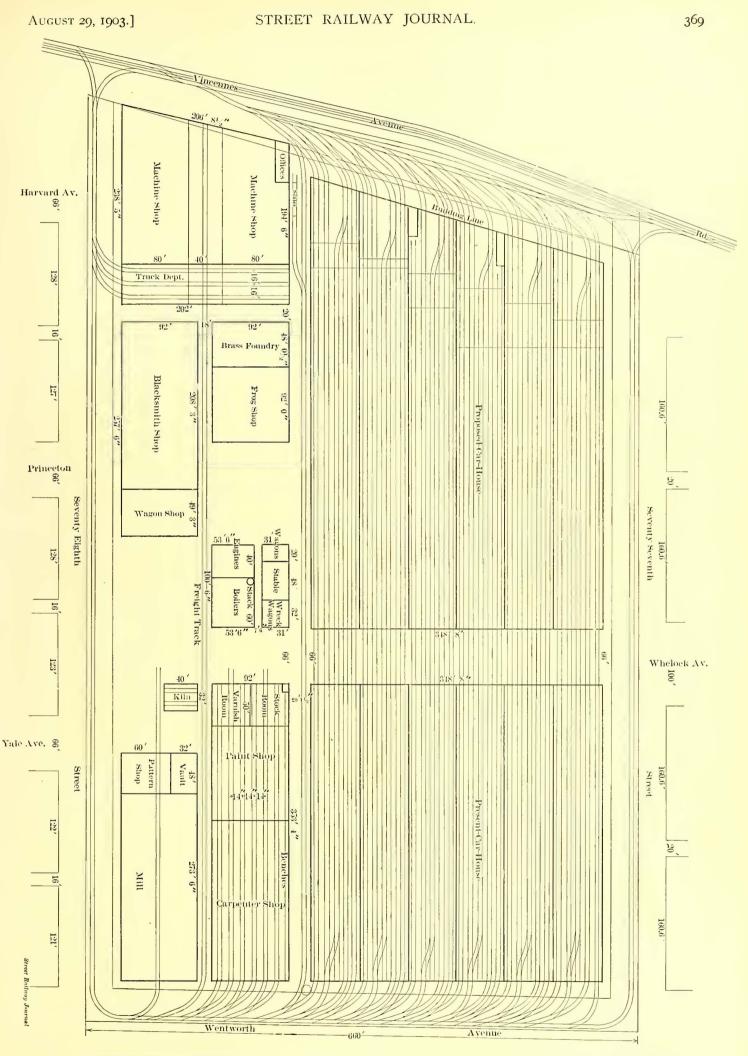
PLAN SHOWING ARRANGEMENT OF NEW REPAIR SHOPS AND CAR HOUSE OF THE CHICAGO CITY RAILWAY
